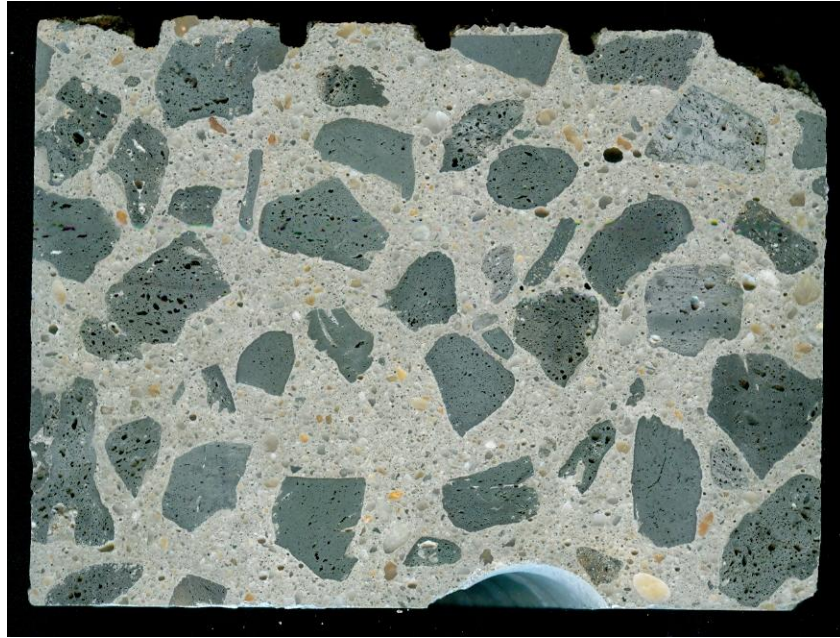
Scanned image of polished surface prepared from bridge deck 3L, core C-6. Bridge deck surface is at top.
